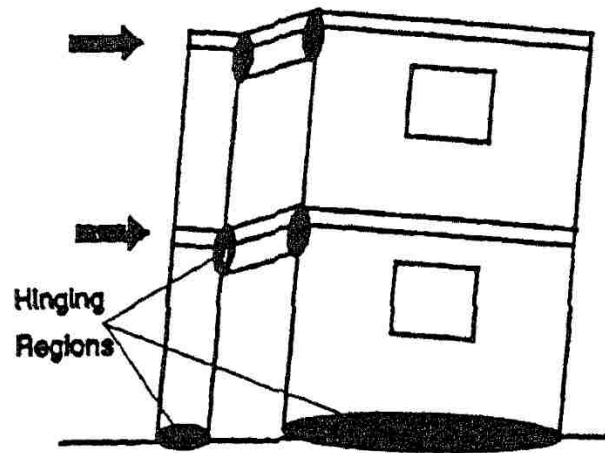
Coupled Wall-type Collapse Mechanism (Klingner and Leiva 1992)
